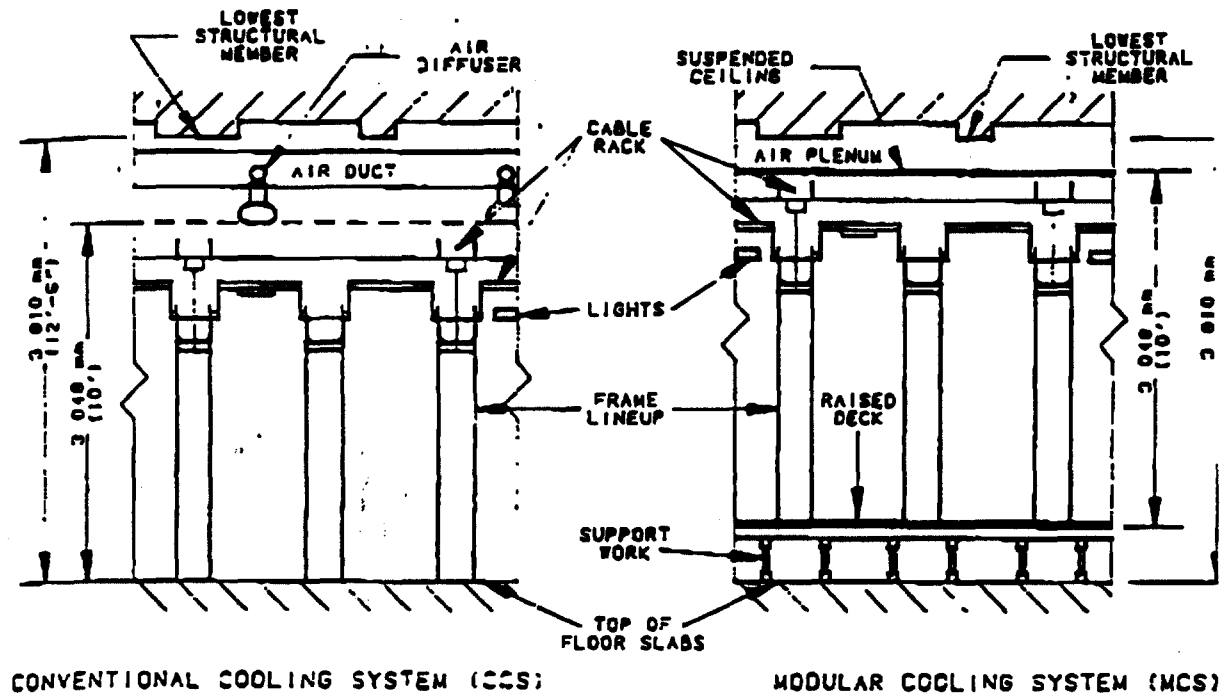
Typical Equipment Frame Area (Vertical Section)
